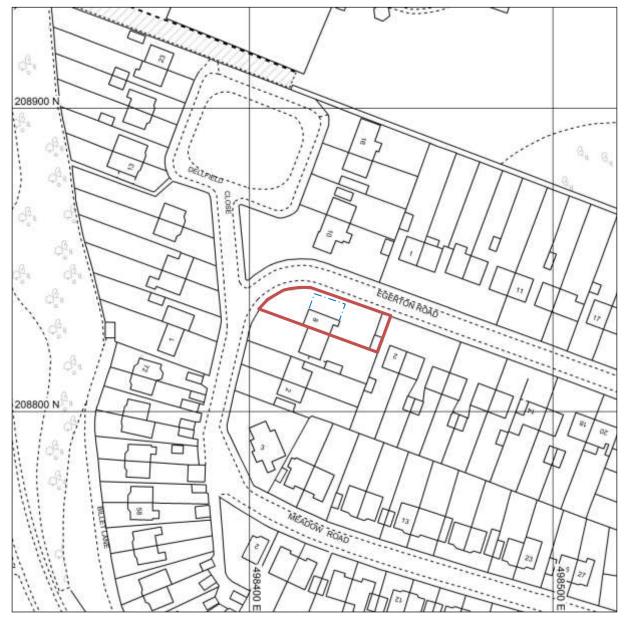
Site plan, extension highlighted in blue (Scale 1: 1250)
